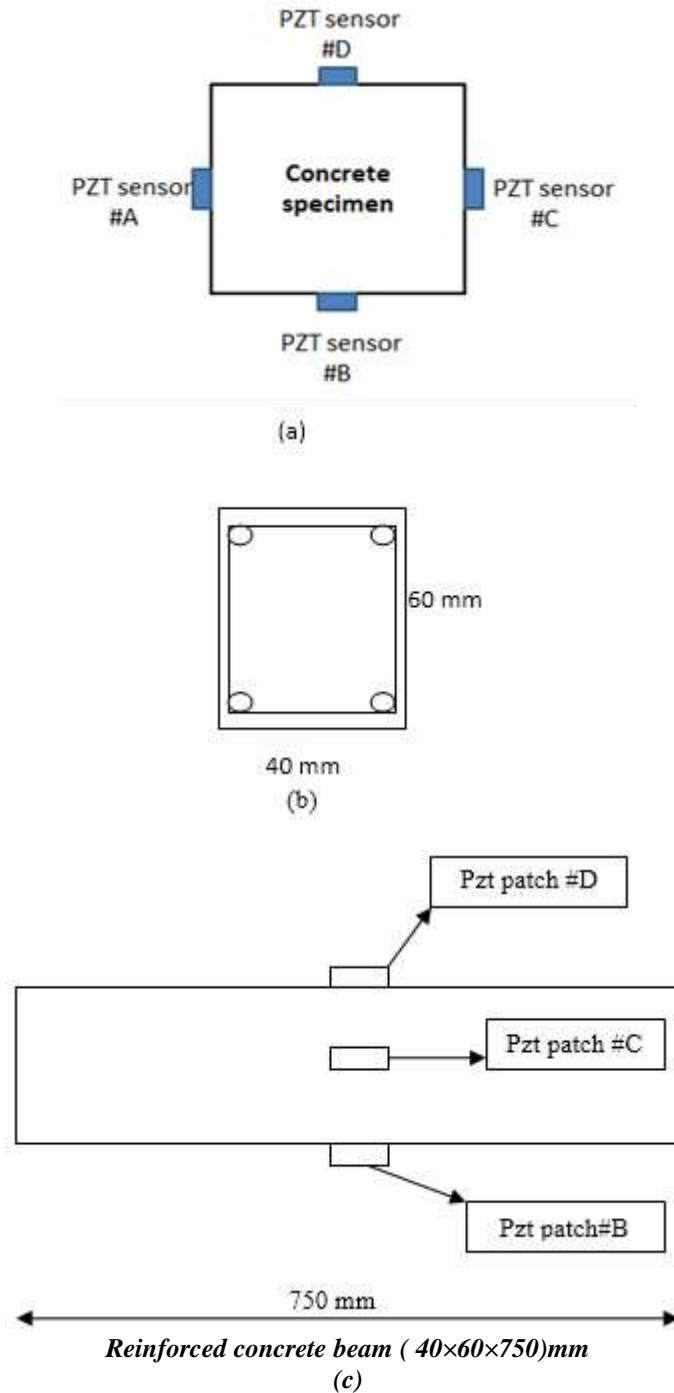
(a) concrete cube specimen with surface bonded pzt patch (b) cross section detail of Rcc beam (c) Rcc beam with attached pzt patch
